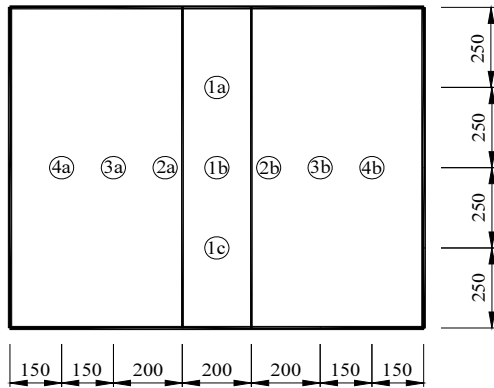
Layout of soil pressure transducer (Unit, mm)
